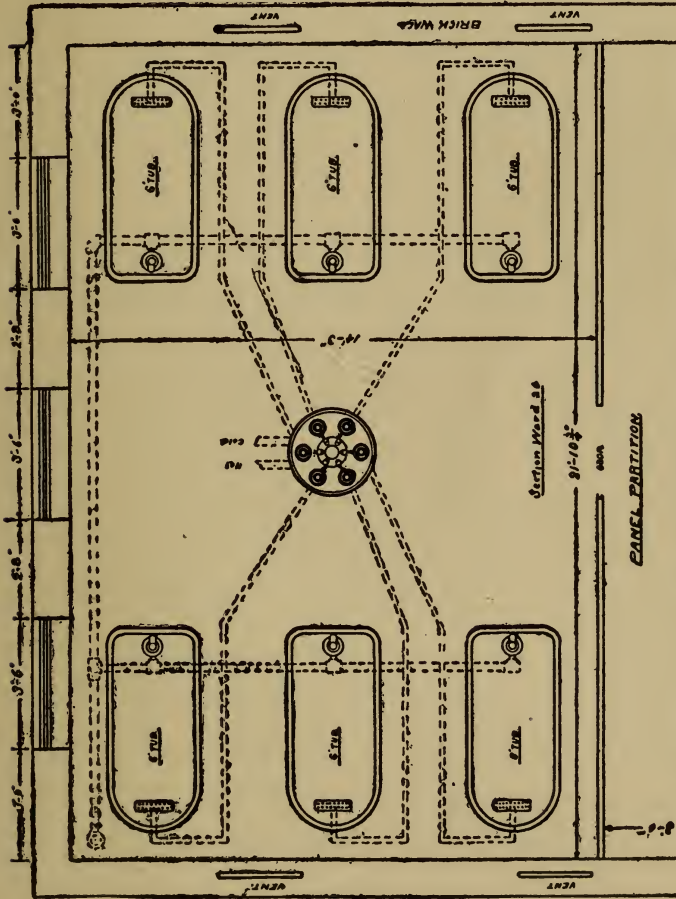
Floor Plan of Dent's Continuous Bath, Manhattan State Hospital.
